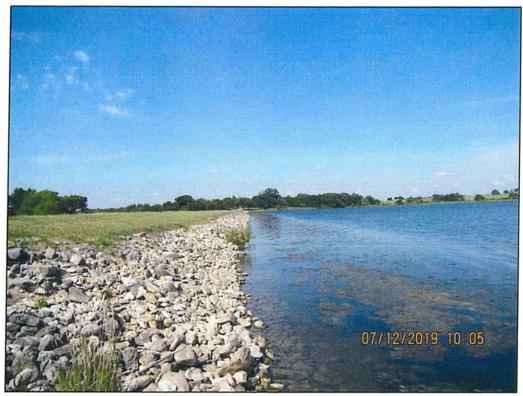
Upstream slope. At service spillway. Looking right. Note minor vegetation in riprap.
